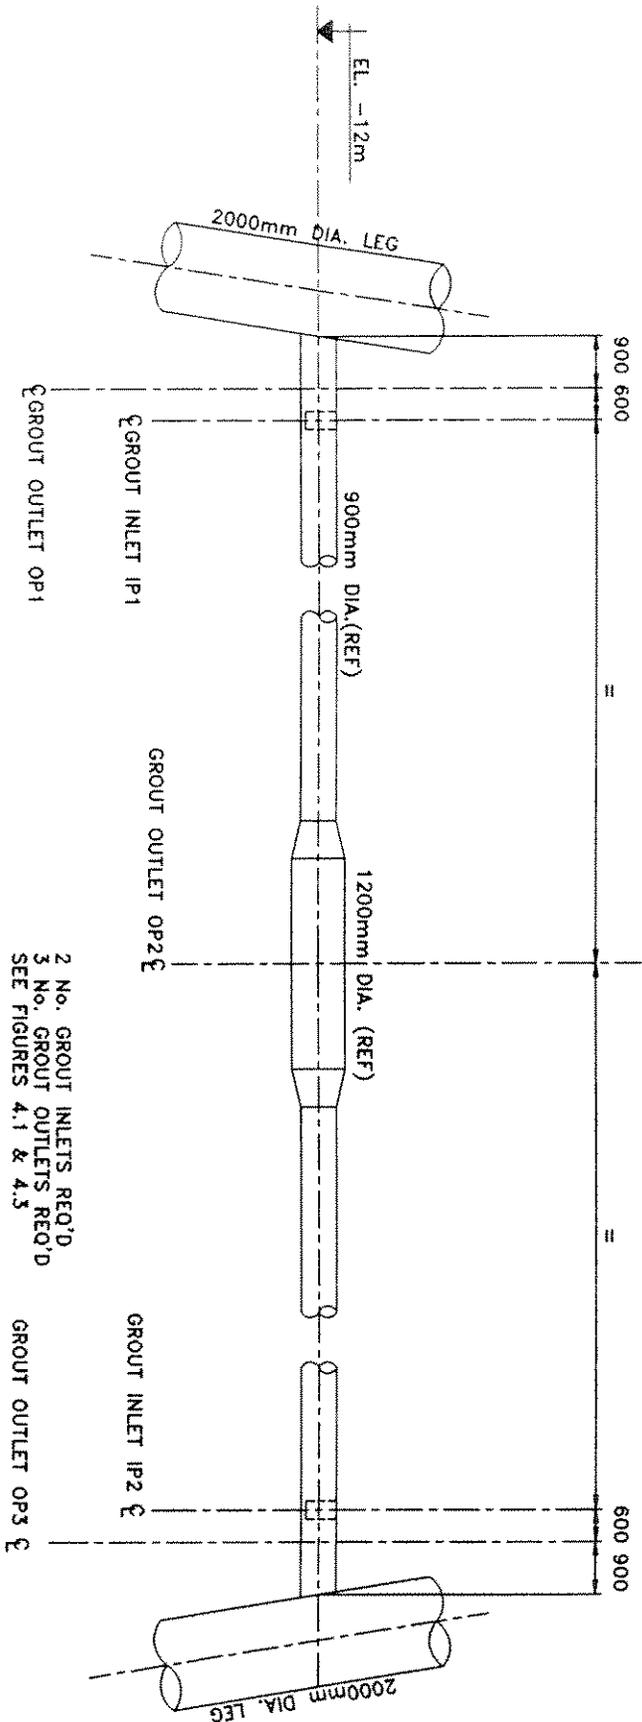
PLAN AT ELEVATION -12m LEVEL
